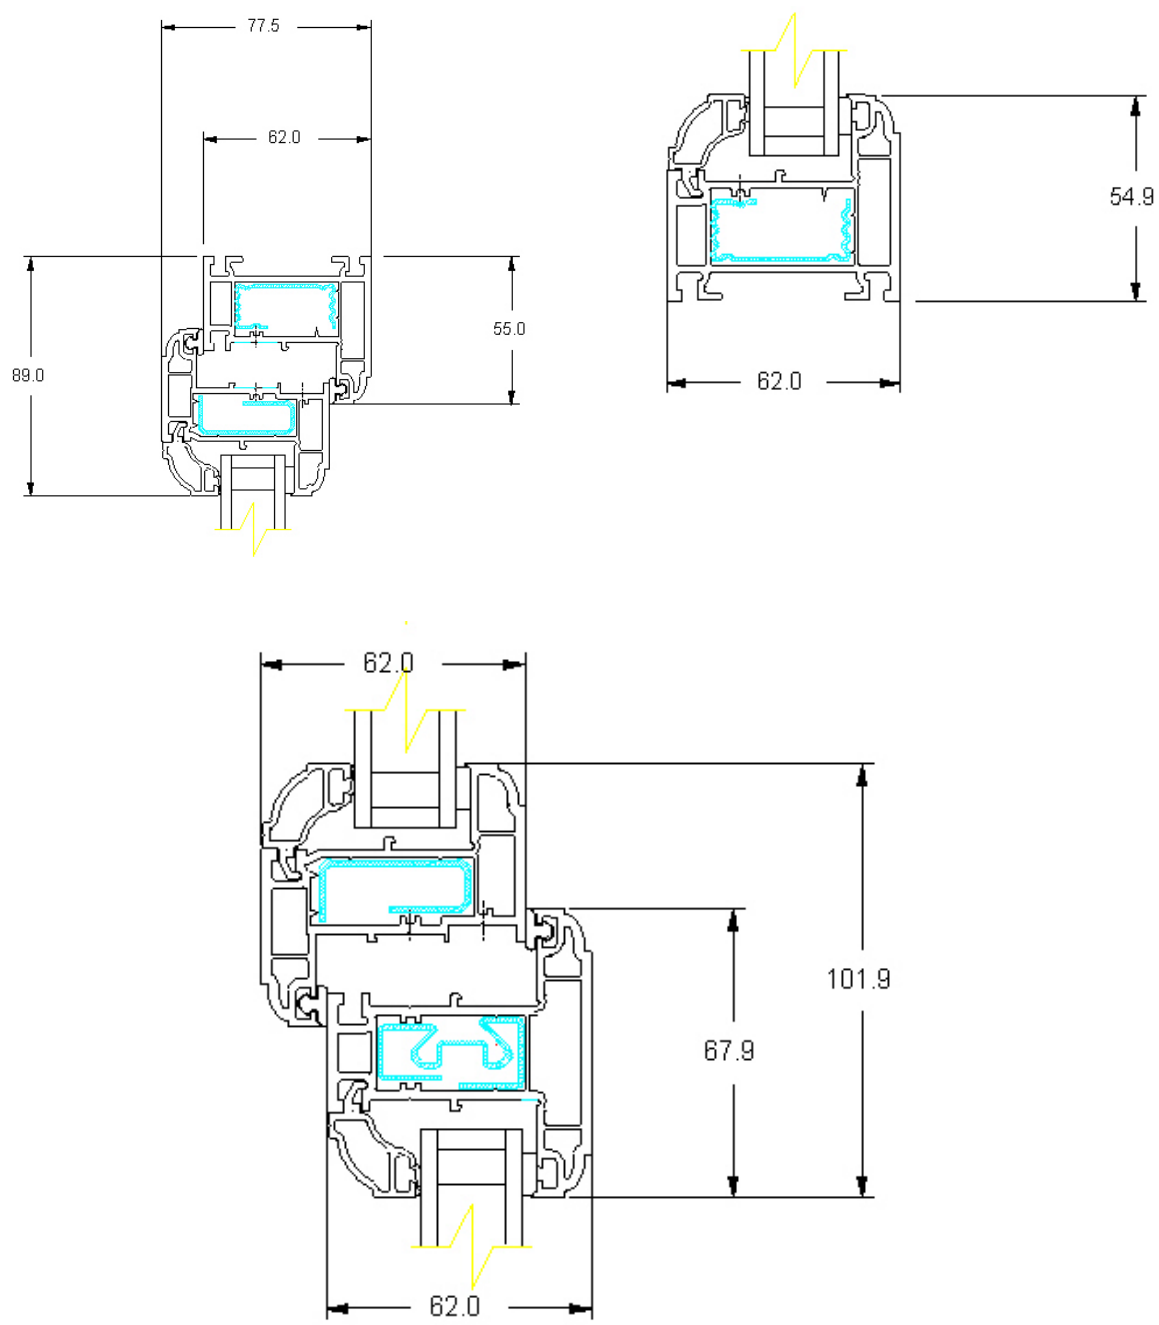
Section drawings of the 5 Chamber PVC-U Frame
